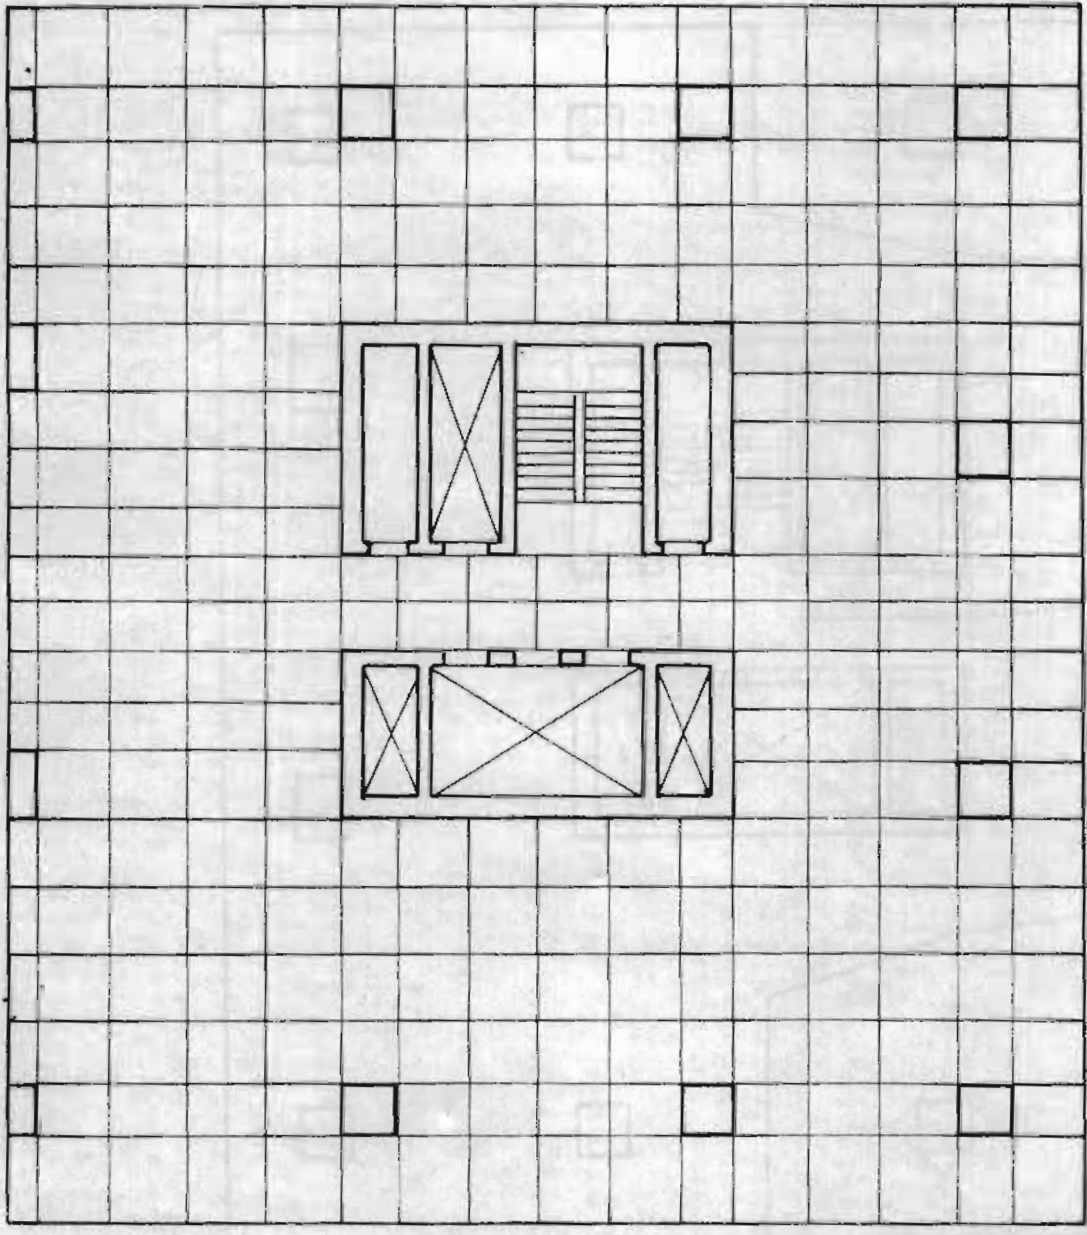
Plan Of The Typical Floor Showing The Finite Element Mesh.
